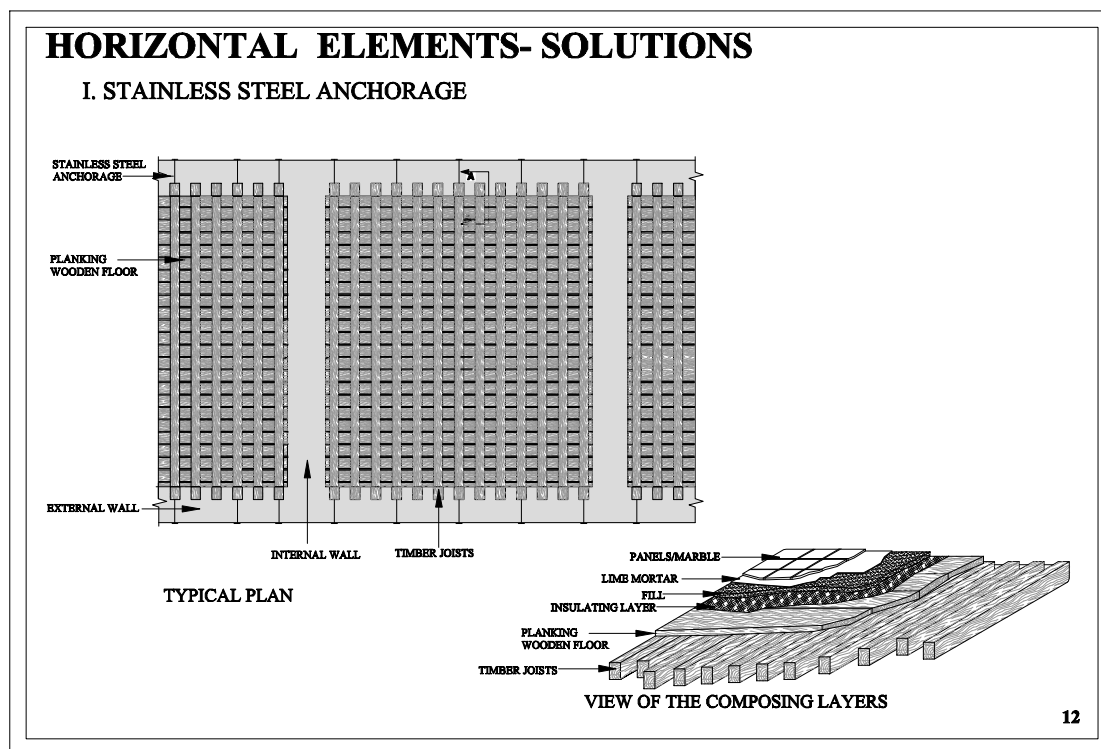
Strengthening of wooden floors and joints anchors developed by IAA. This method of anchors was used in conservation projects in Acre since 1995, (Source: IAA).
